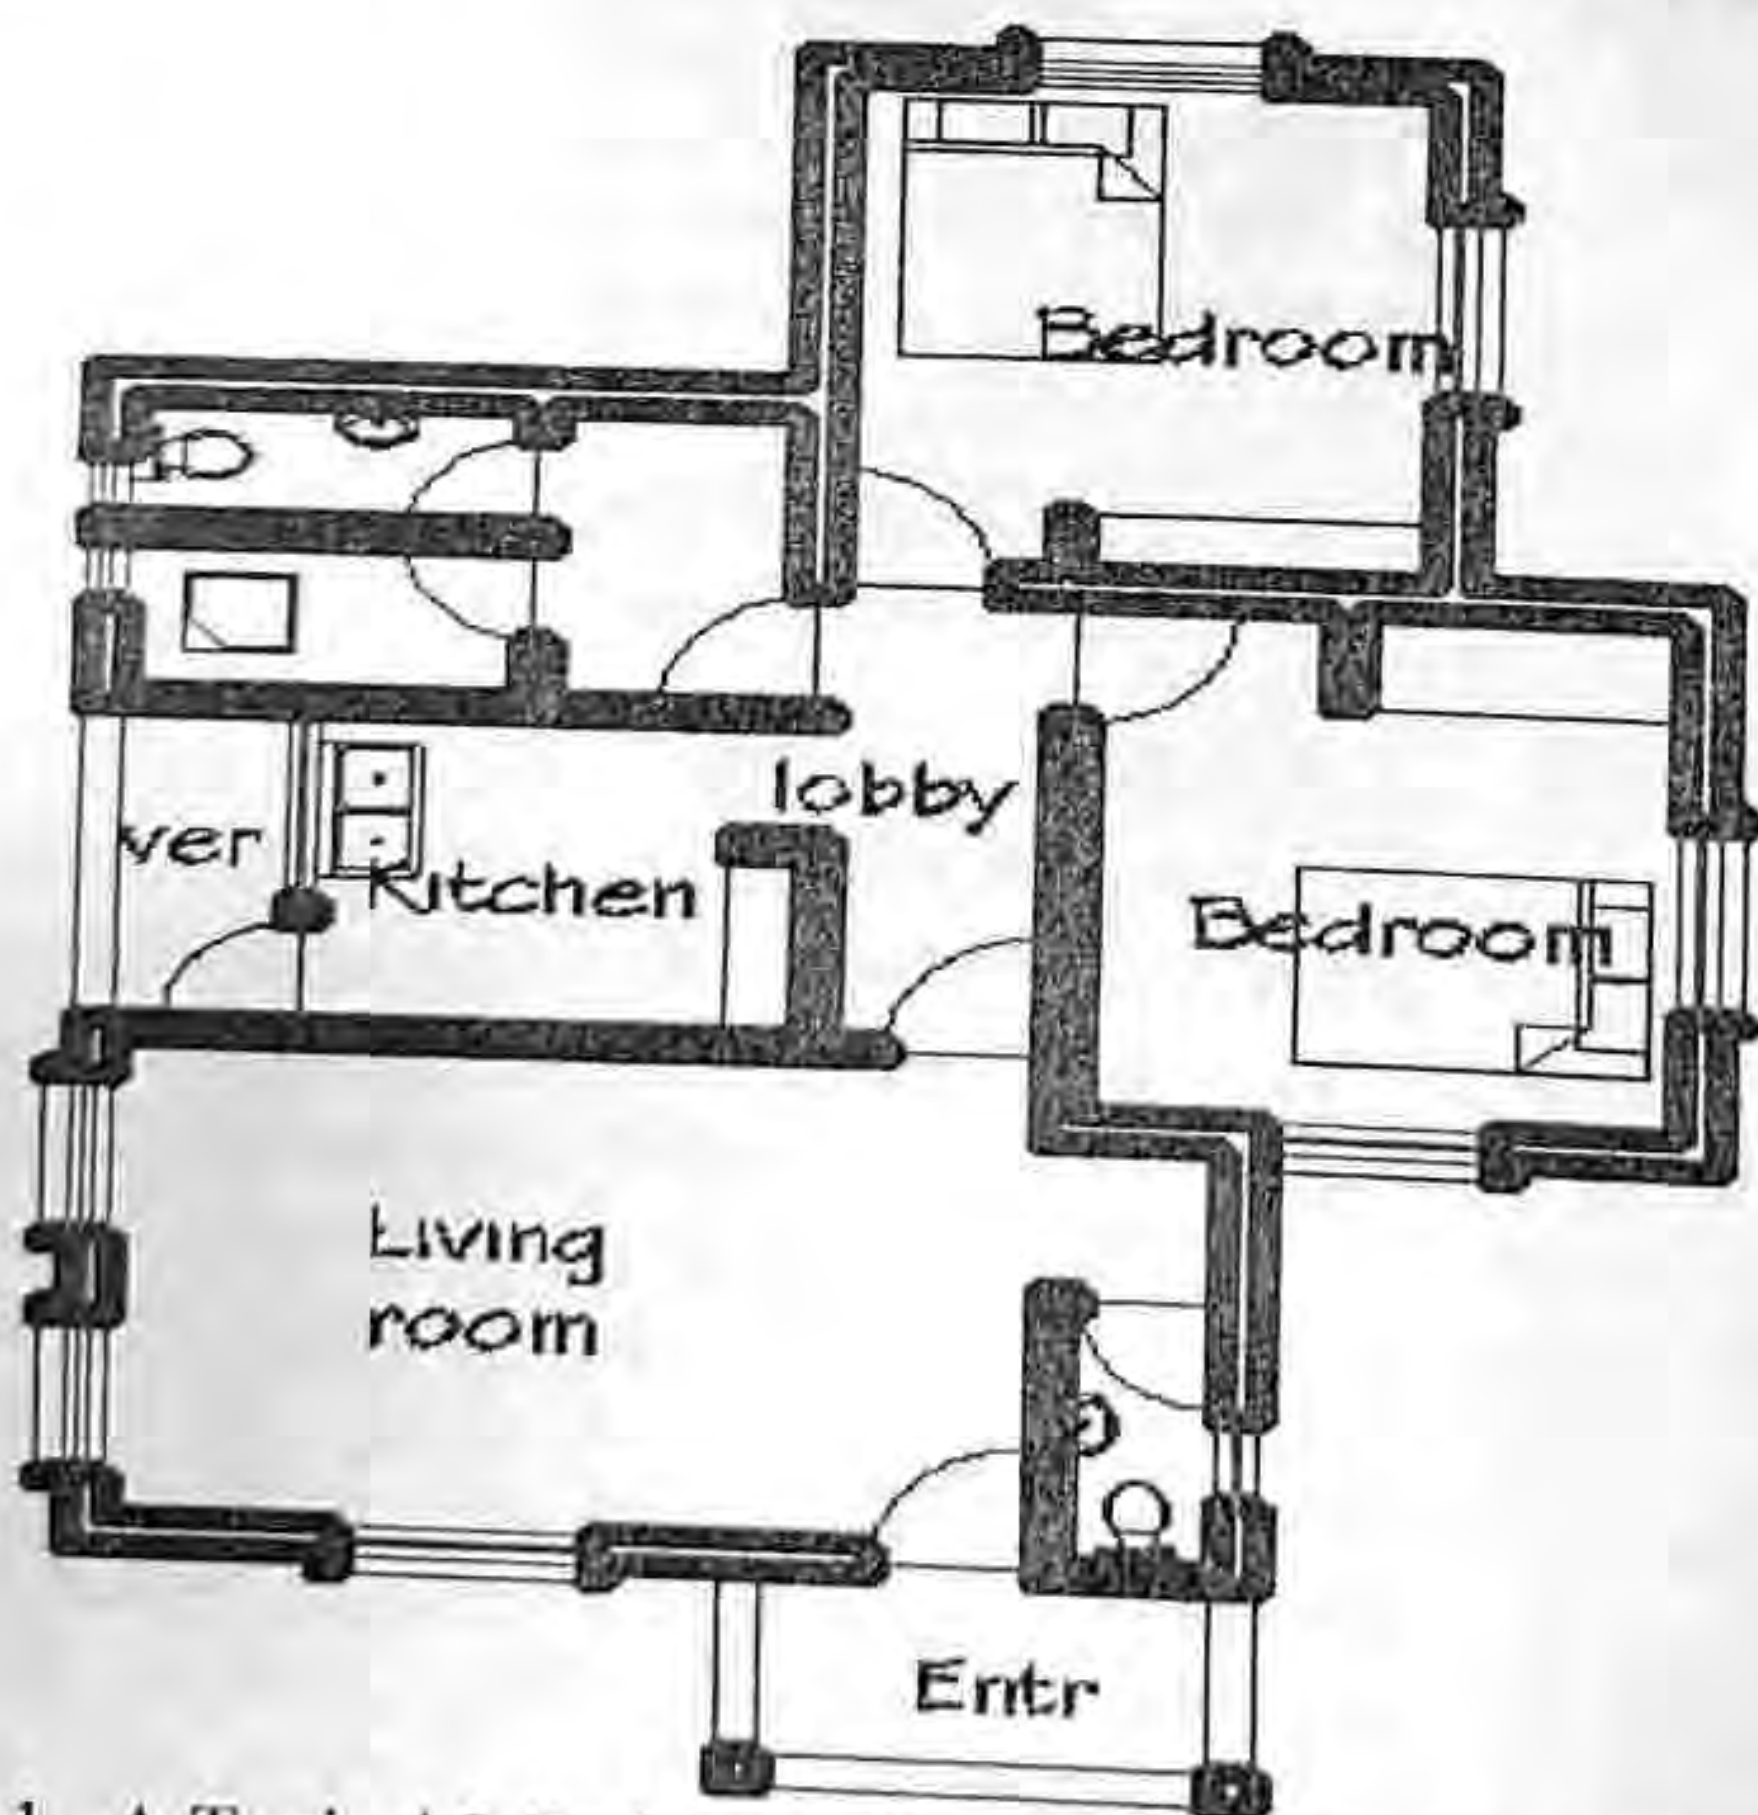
A Typical 2 Bedroom Floor Plan of the Talba Housing Estate Minna.
